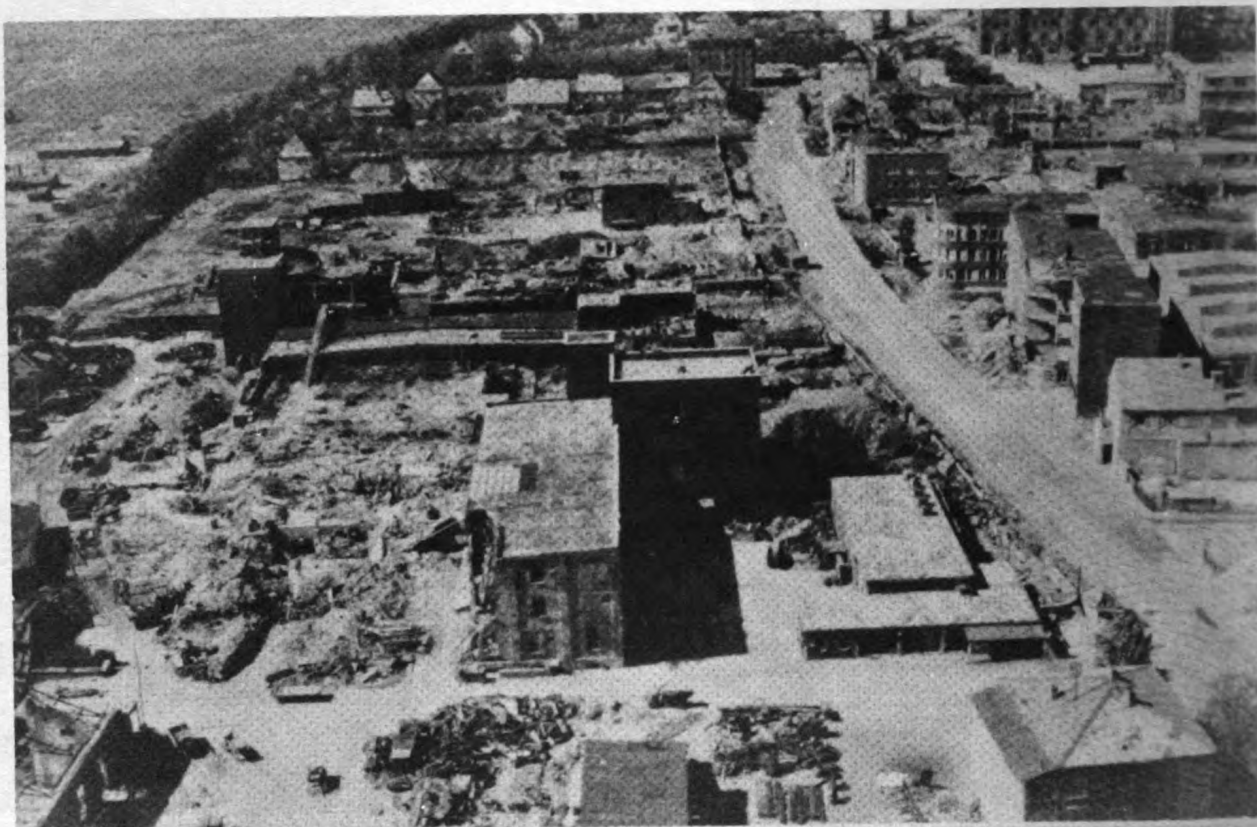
Aerial view close-up at 300 ft. looking west. Note debris piled over underground structure (left center).
